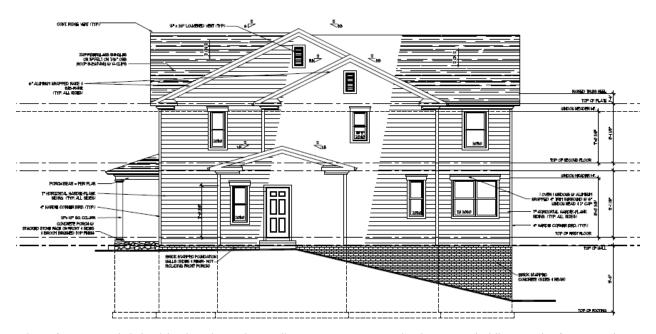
Proposed right side elevation. The applicant proposes to retain the stone cladding on the front porch side and use a brick-stamped concrete on the foundation of the main house.
